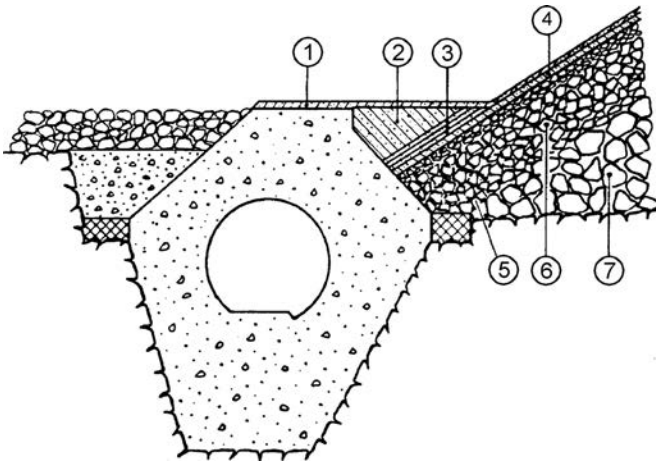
Joint of the facing with the concrete gallery at Salagou dam (after Thomas, 1976). (1) Protective asphaltic concrete layer; (2) asphaltic concrete; (3) three layers of asphaltic concrete; (4) asphaltic concrete lining; (5) course stabilized with bituminous mastic; (6) rockfill 80–250 mm; (7) rockfill.
